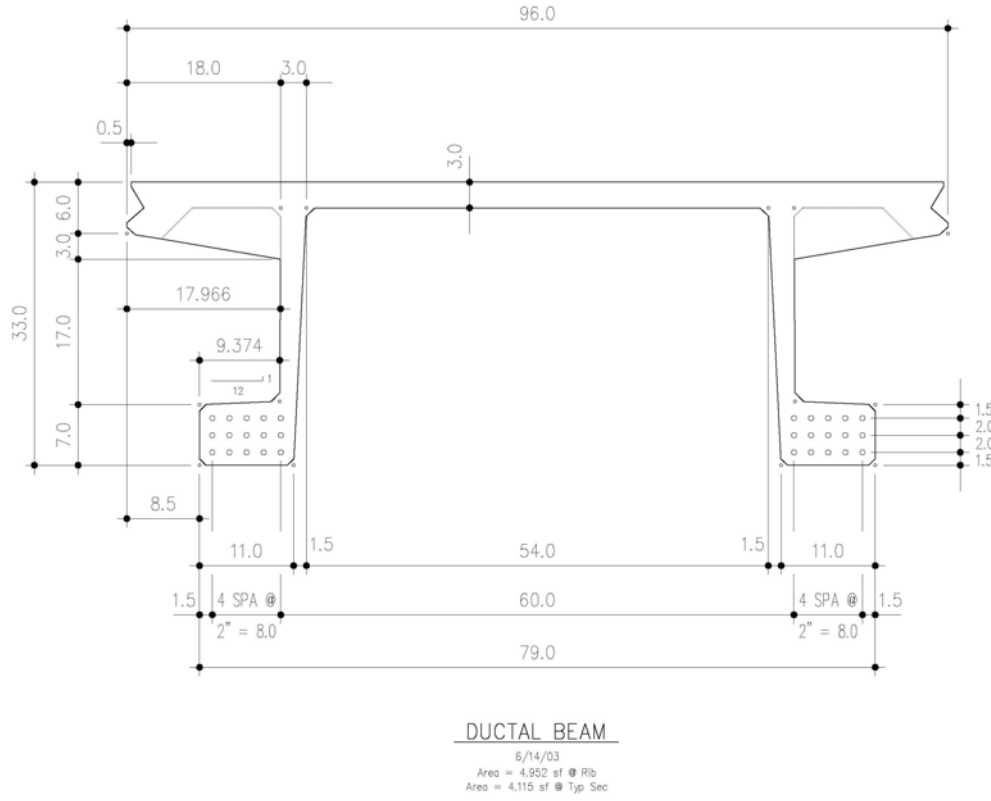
MIT optimized DuctalTM bridge girder section (unit: *inch*) [20].
